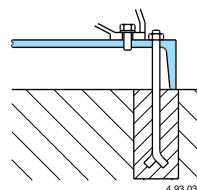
Foundation for unit mounted on single-piece, channel-steel baseplate.
